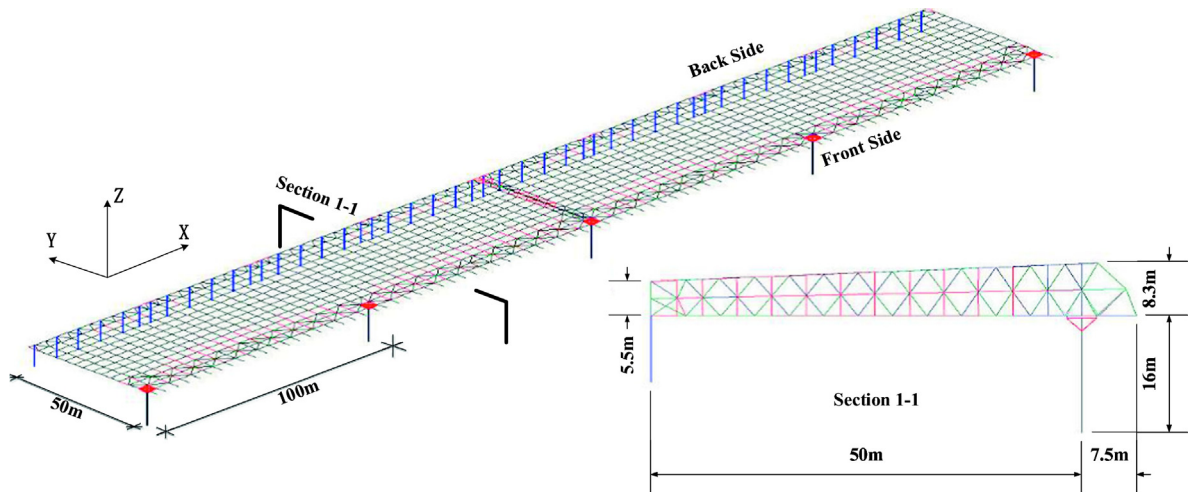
Orthographic and transverse section view of reticulated roof structure.
